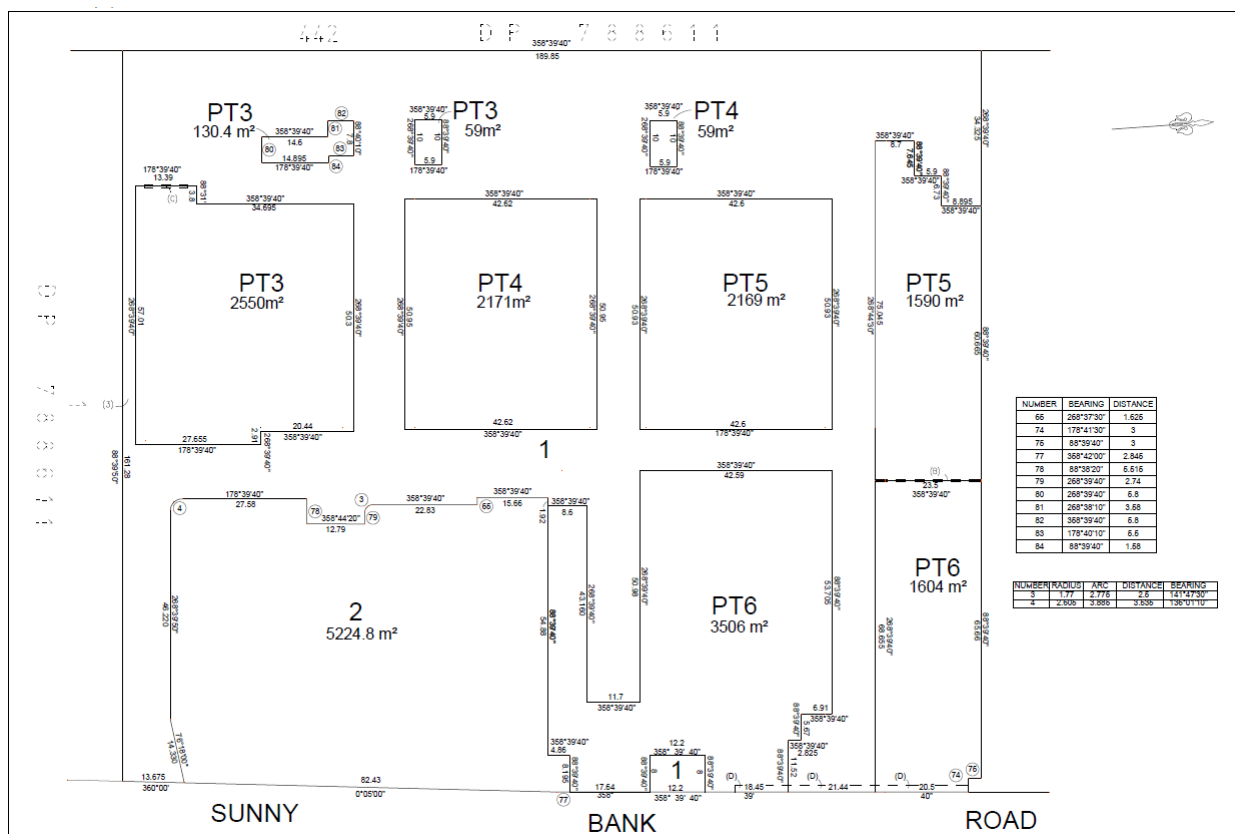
Extract of Proposed Subdivision Plan (Source: Project Surveyors)
